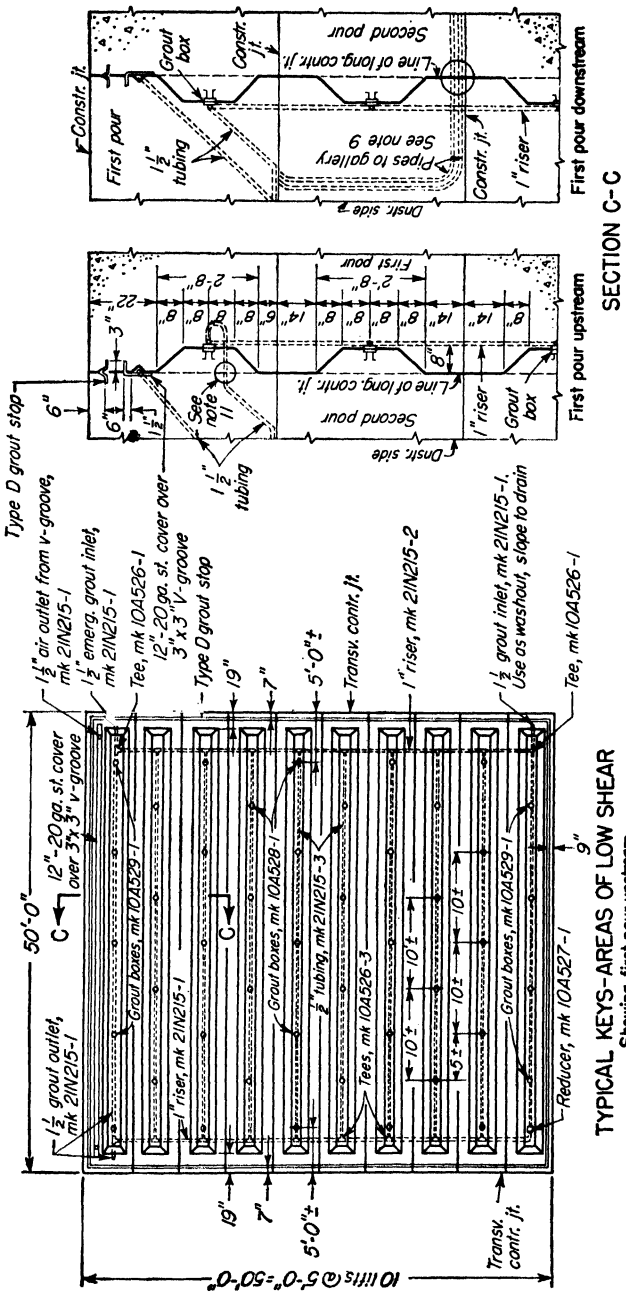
Fontana Dam—typical detail of longitudinal joints.
